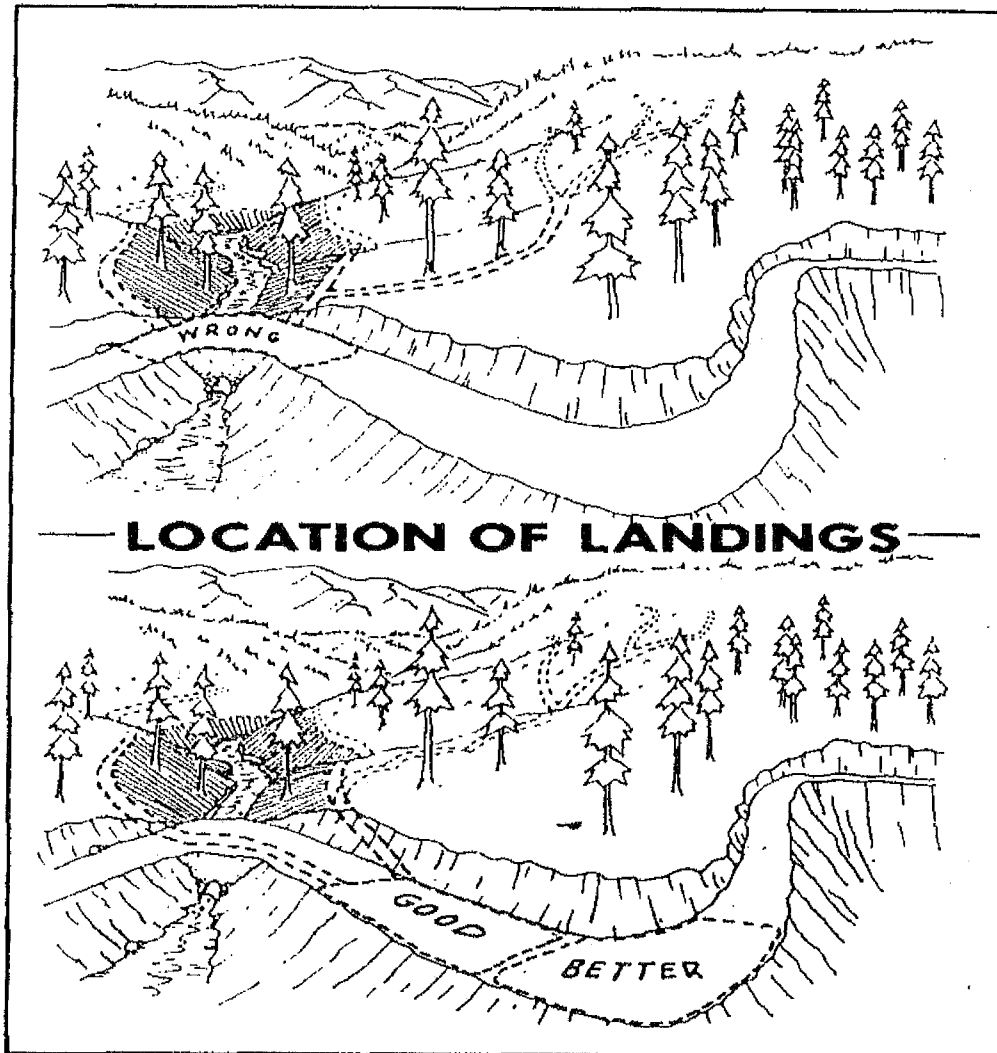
Log landings on forest road systems should be kept to the absolute minimum size necessary to accommodate yarding, loading and hauling equipment and the minimum number needed to remove timber resources. Landings constructed on gentle ground and broad ridge crests far removed from stream channels are least likely to cause water quality problems, whereas landings built on steep slopes and near watercourses can result in severe impacts. From Weaver and Hagans (1994). Adapted from (USFS, 1963).
